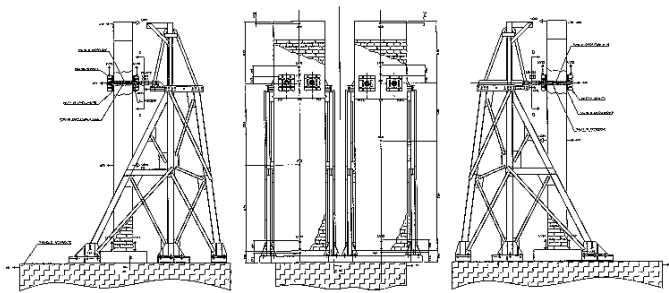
Mock-ups used in the shaking table tests (left) and wall connection with a steel frame through SMADs (right) with SMA connections
